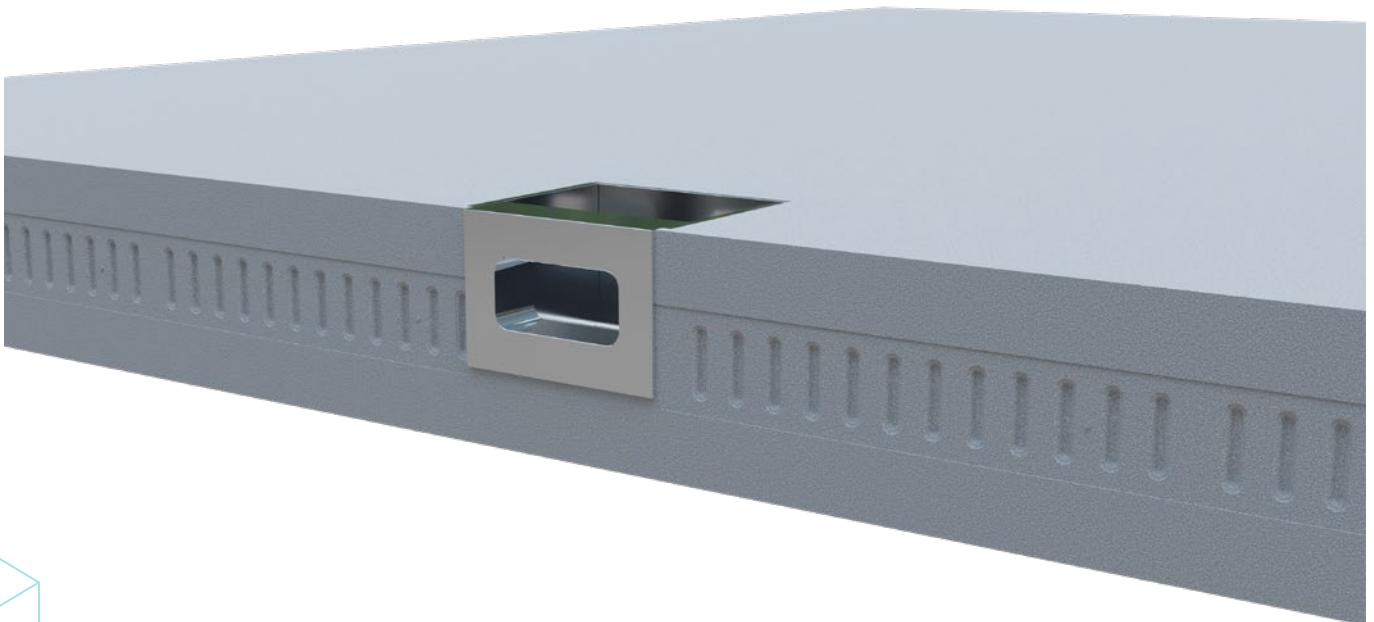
GRIP STAYS AT SAME POSITION AFTER REMOVING OF CONCRETE PRECAST ELEMENT. IT CAN BE USED AGAIN AFTER CLEANING OF THE SURFACE FROM CONCRETE DEBRIS.
